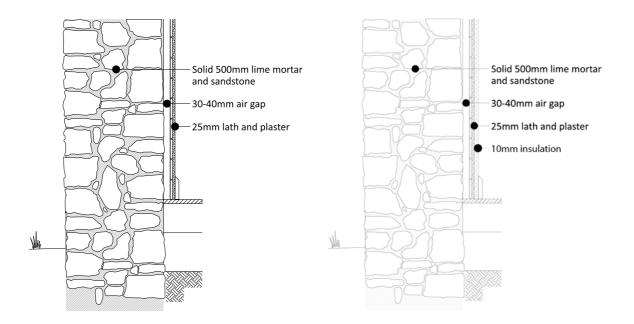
Wall detail before adding insulation; this wall type was typical of the properties assessed in this report
